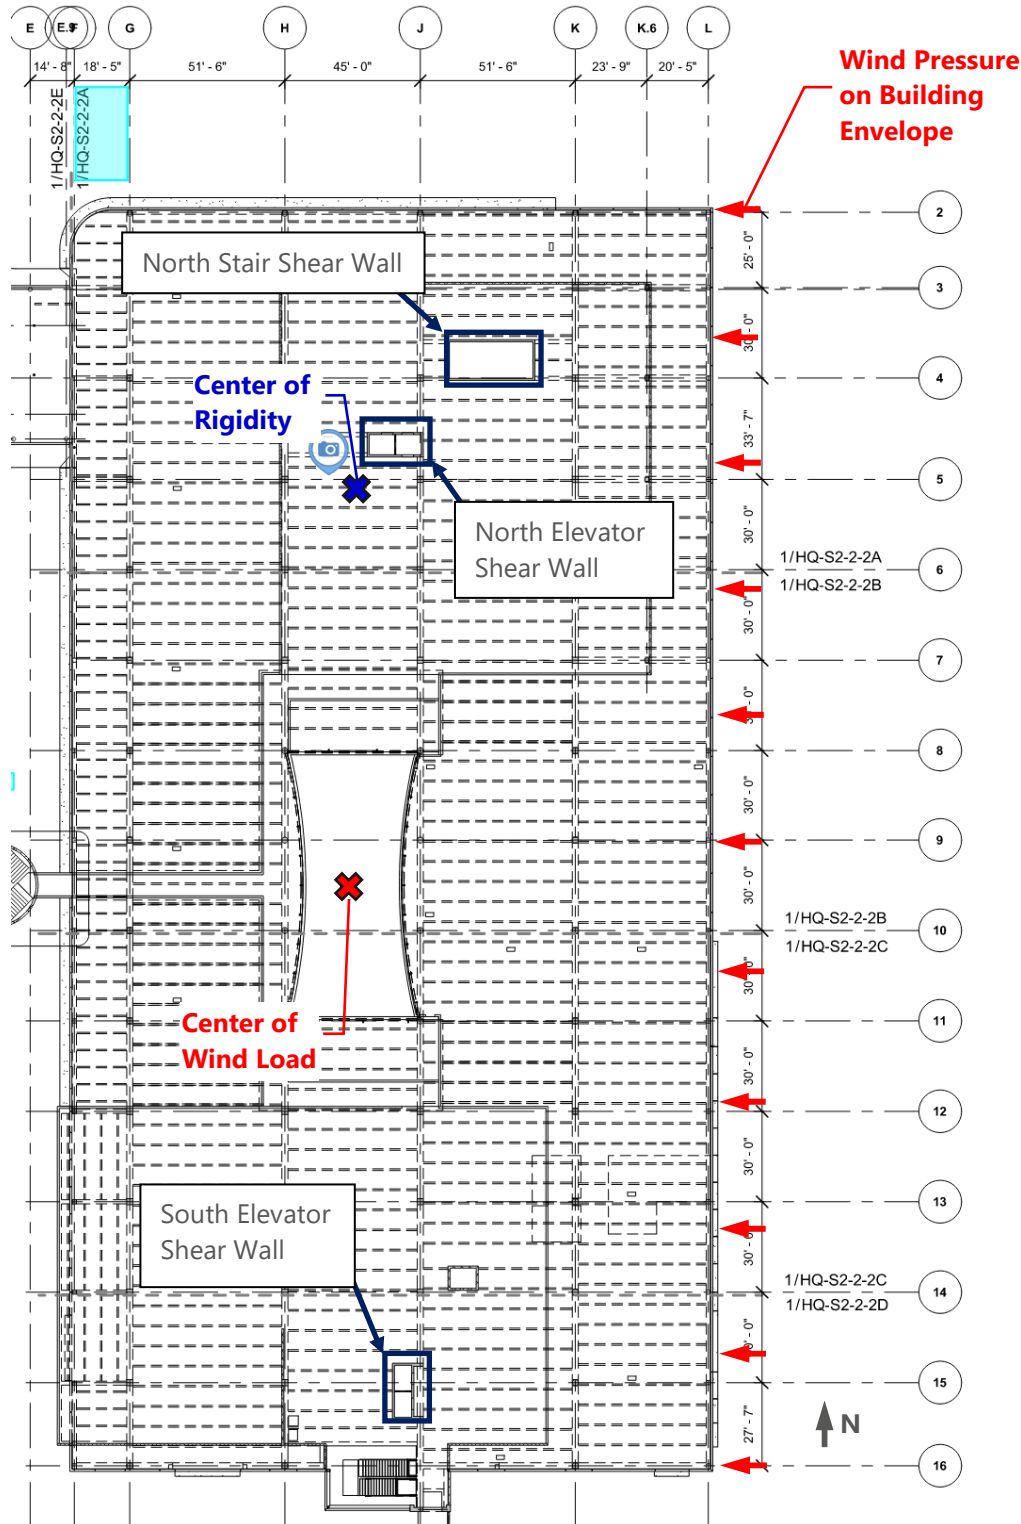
Plan view of FLPHQ showing the approximate locations of the center of rigidity and east-west wind loads. Due to eccentricity between the two, the structure twists
